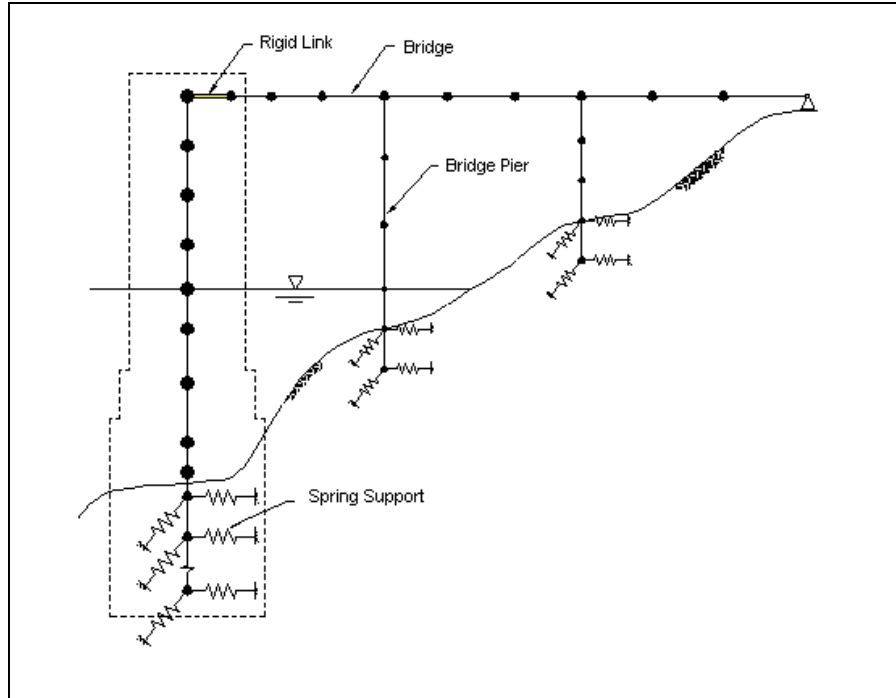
Finite element idealization of free-standing tower and access bridge
